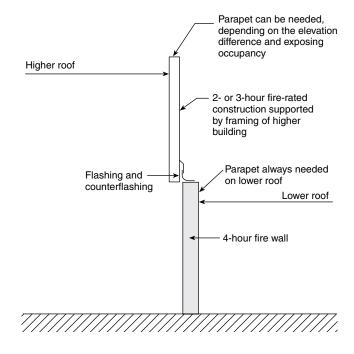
(b) Fire wall arrangement at elevation difference (cantilever wall).
